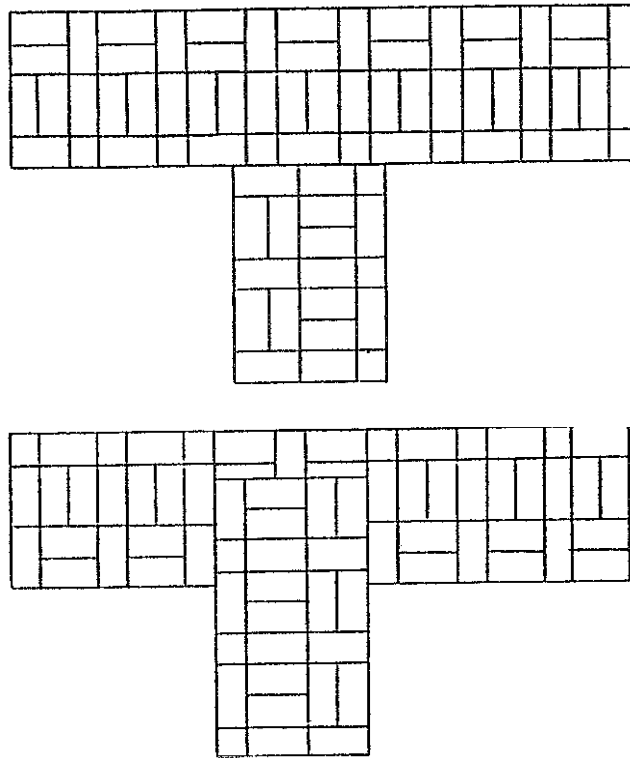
The alternate plan courses of a stopped intersection between two and a half brick thick walls built in double Flemish bond.
